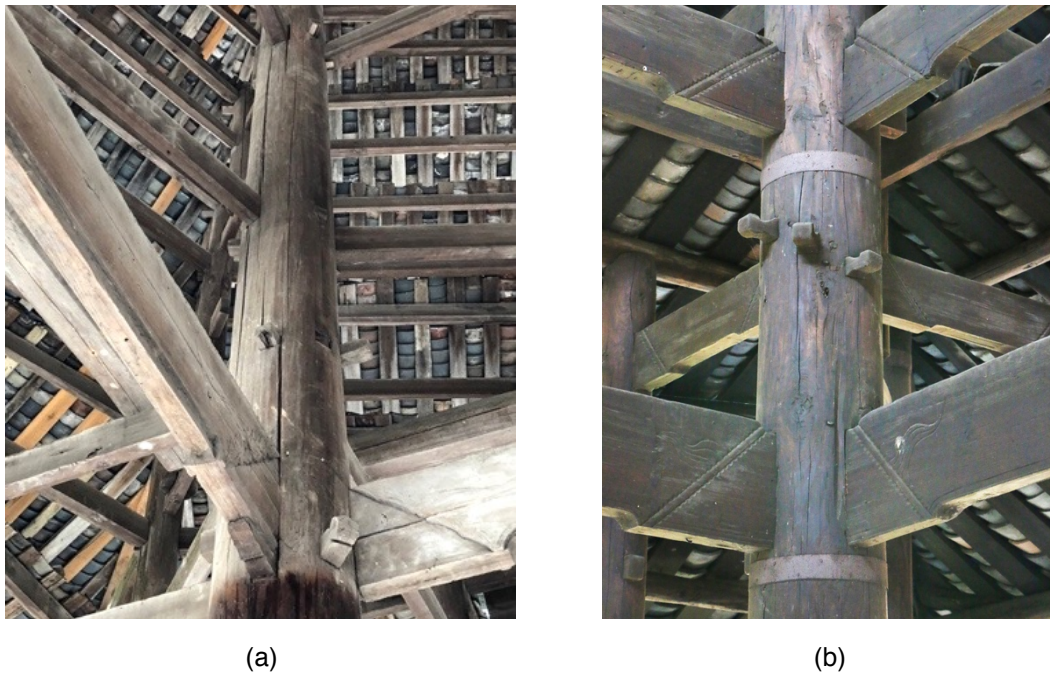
Splitting along the connection of column and tie-beams (Photograph by author)
